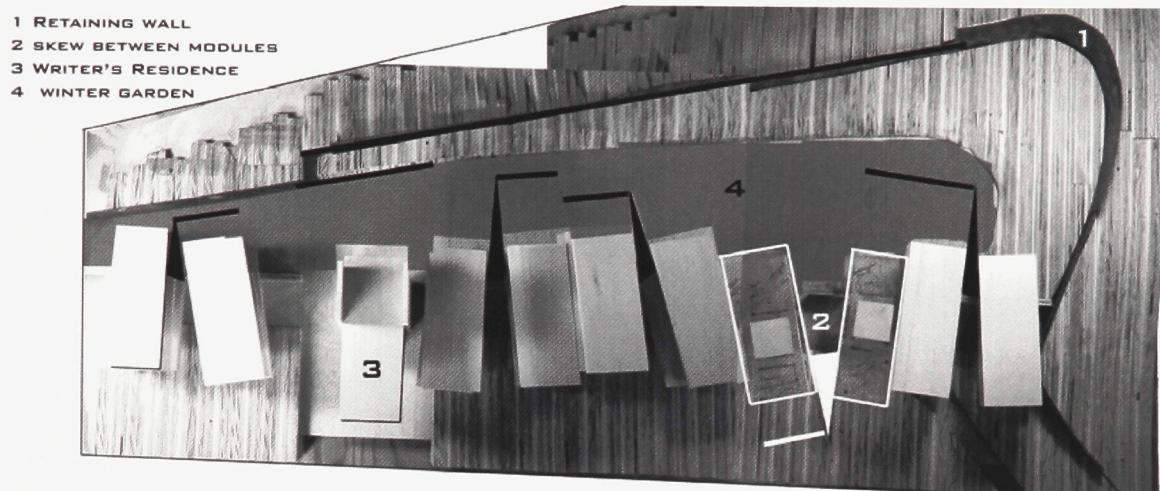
Site plan of Residence Building showing modules and retaining wall, photograph of wooden model, 2006, created by author.
